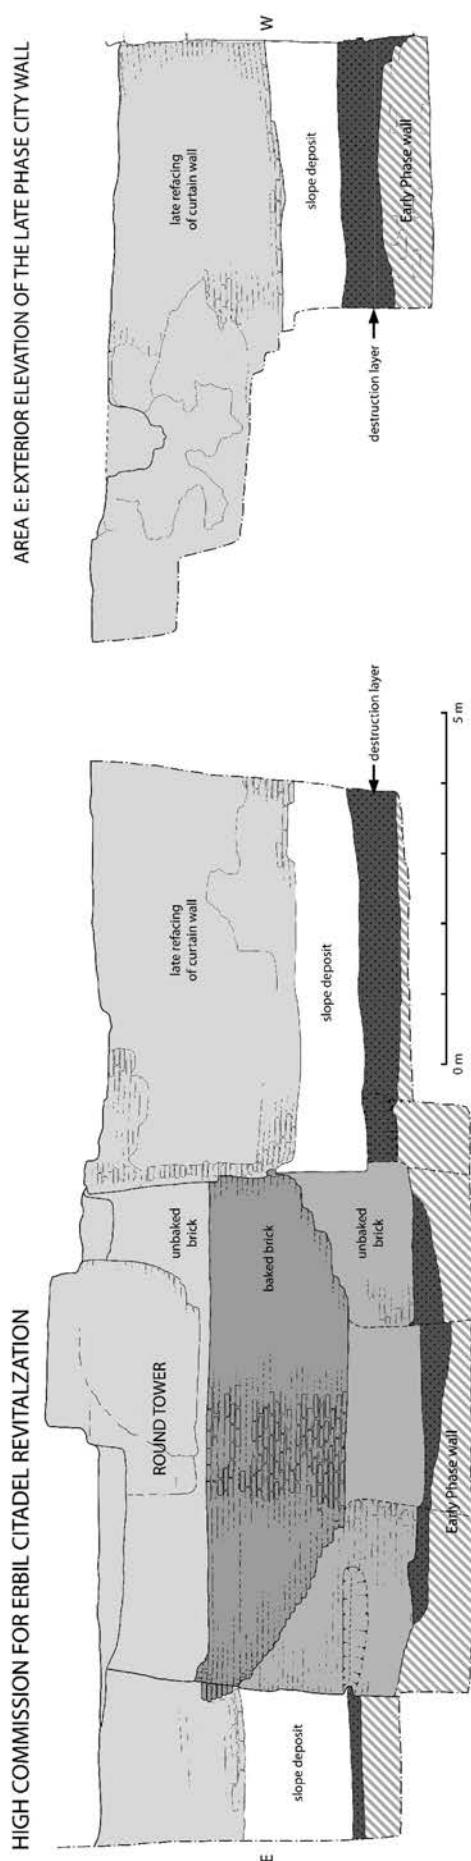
AREA E, ELEVATION OF THE FORTIFICATION WALL.
